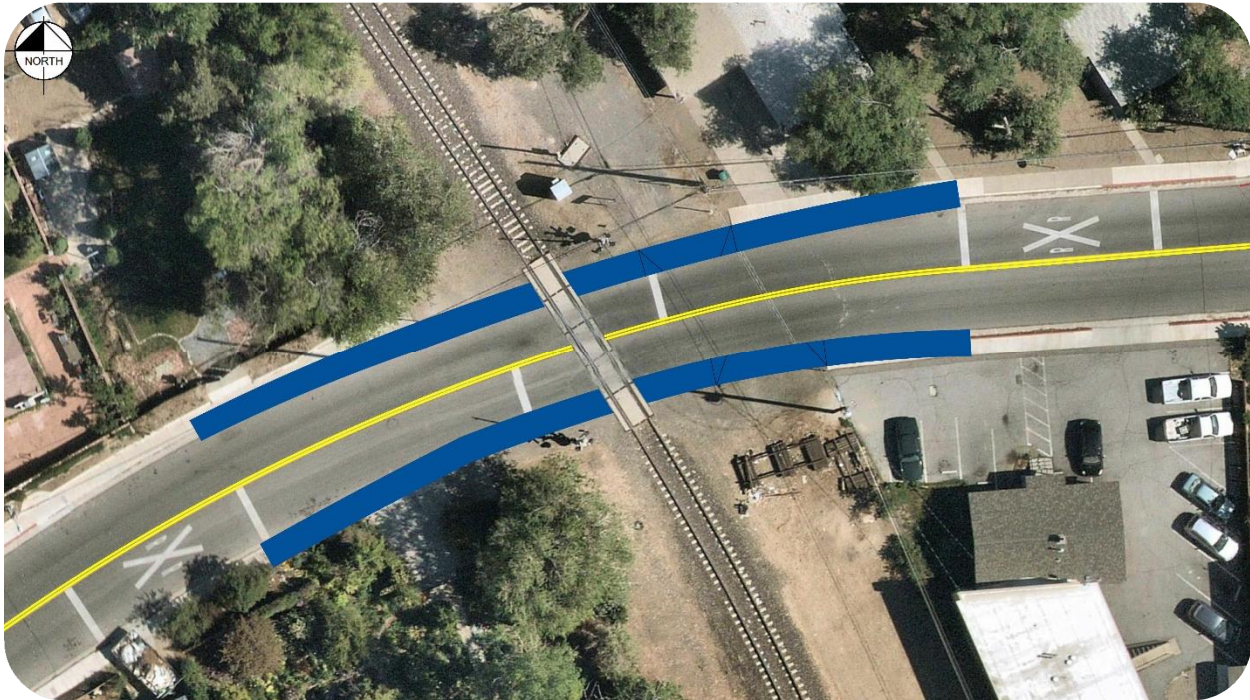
Road Closure at 9<sup>th</sup> Street and Lake Street Photo Rendering
